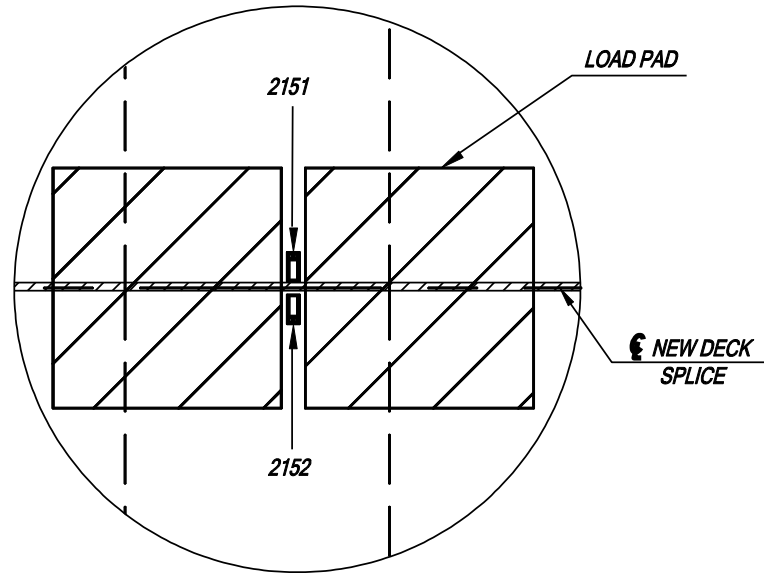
Plan view of Deck specimen with instrumentation on deck plate and floor beam (drawn by Alapati)
